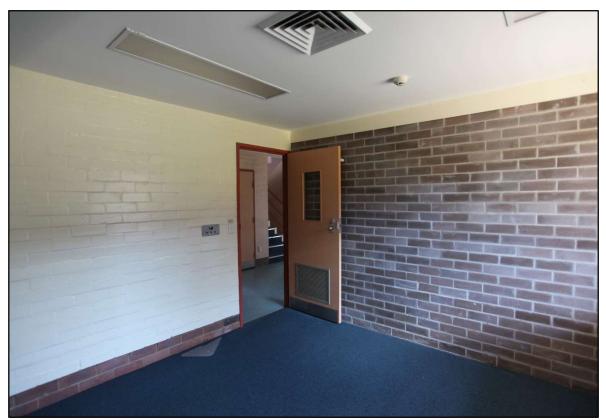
Typical internal office showing lino and carpet floorings, painted and face brick with plaster ceiling (Block A-Level 1)
